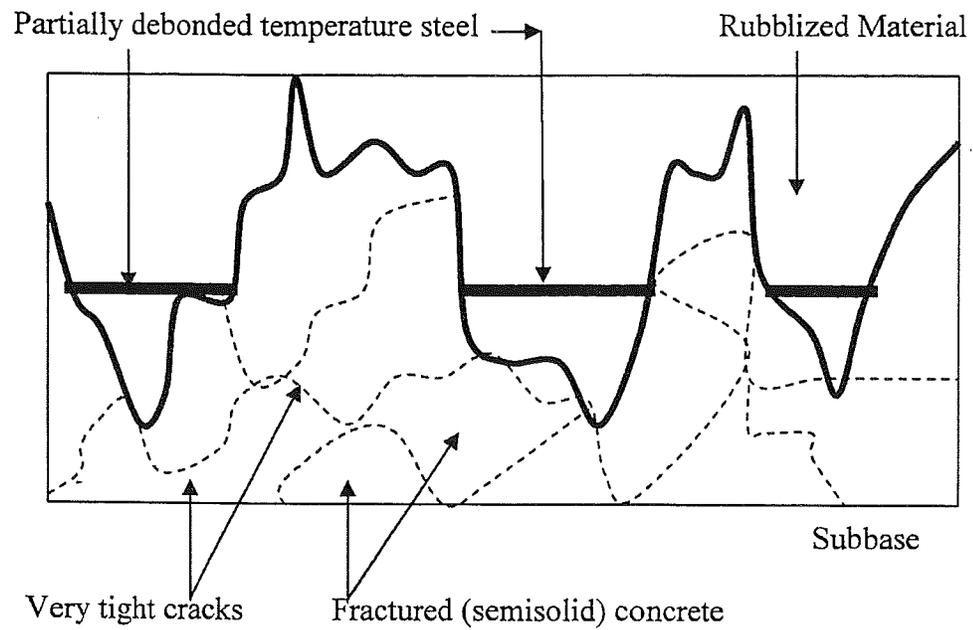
Schematic of rubblized concrete slab showing rubblized and fractured layers
